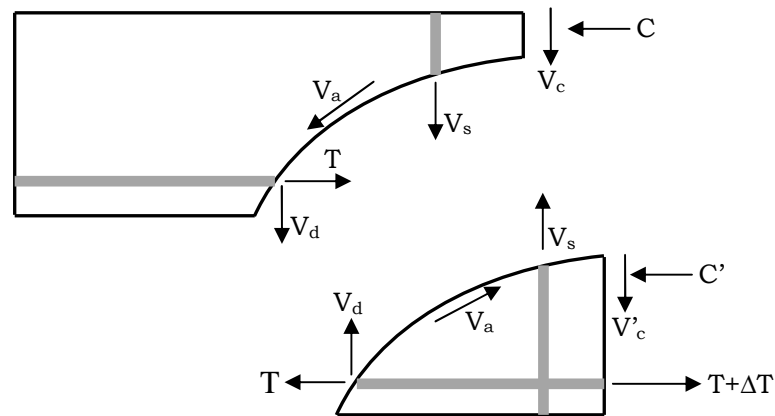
Equilibrium of forces in a slender RC beam with stirrups
